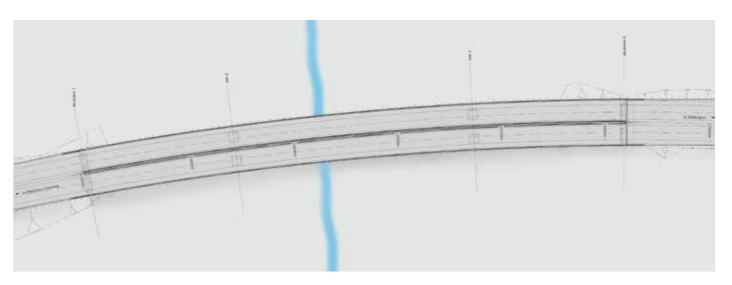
Bridge 20 Cannons Creek Bridge plan
